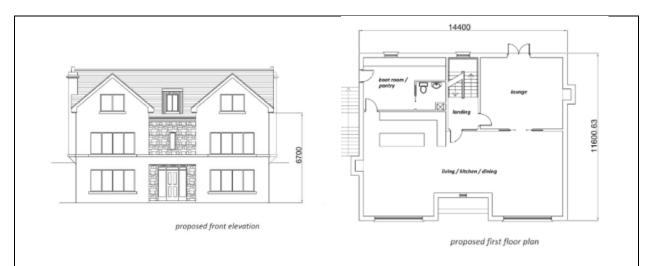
House Type F with Living/Kitchen/Dining Accommodation at First Floor
